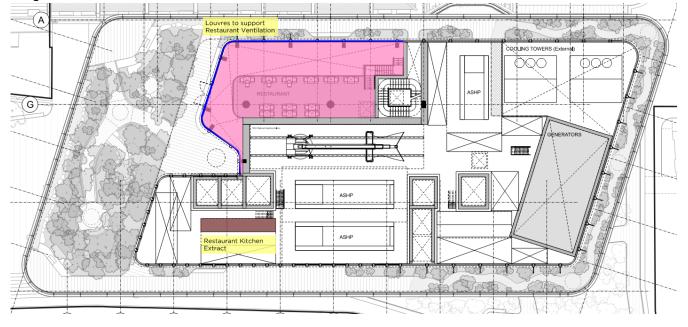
Level 25 -Location of Restaurant, louvres serving restaurant and Kitchen Extract plant
